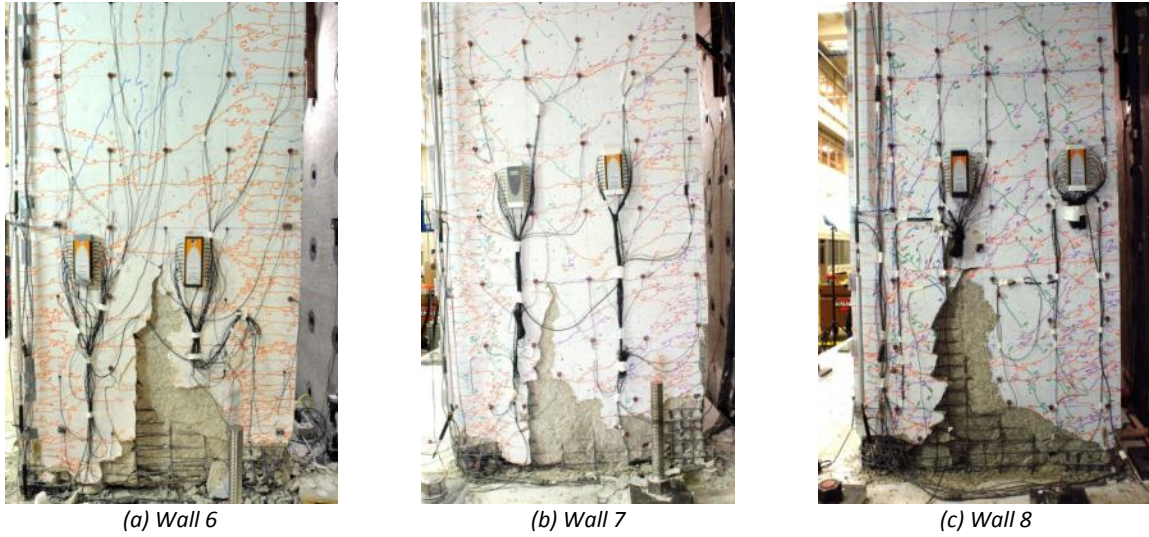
East flange damage attributed to out-of-plane movement
